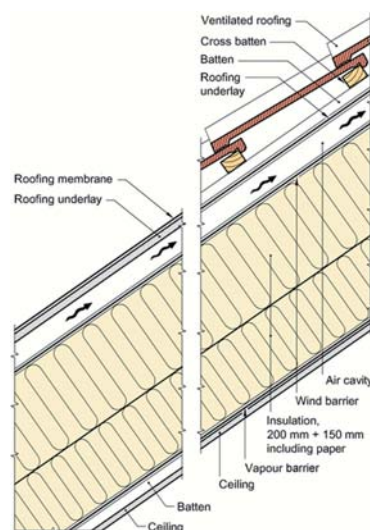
Roof Type A, which separates the rain and wind barrier [13]. Here shown with two common types of roofing.
